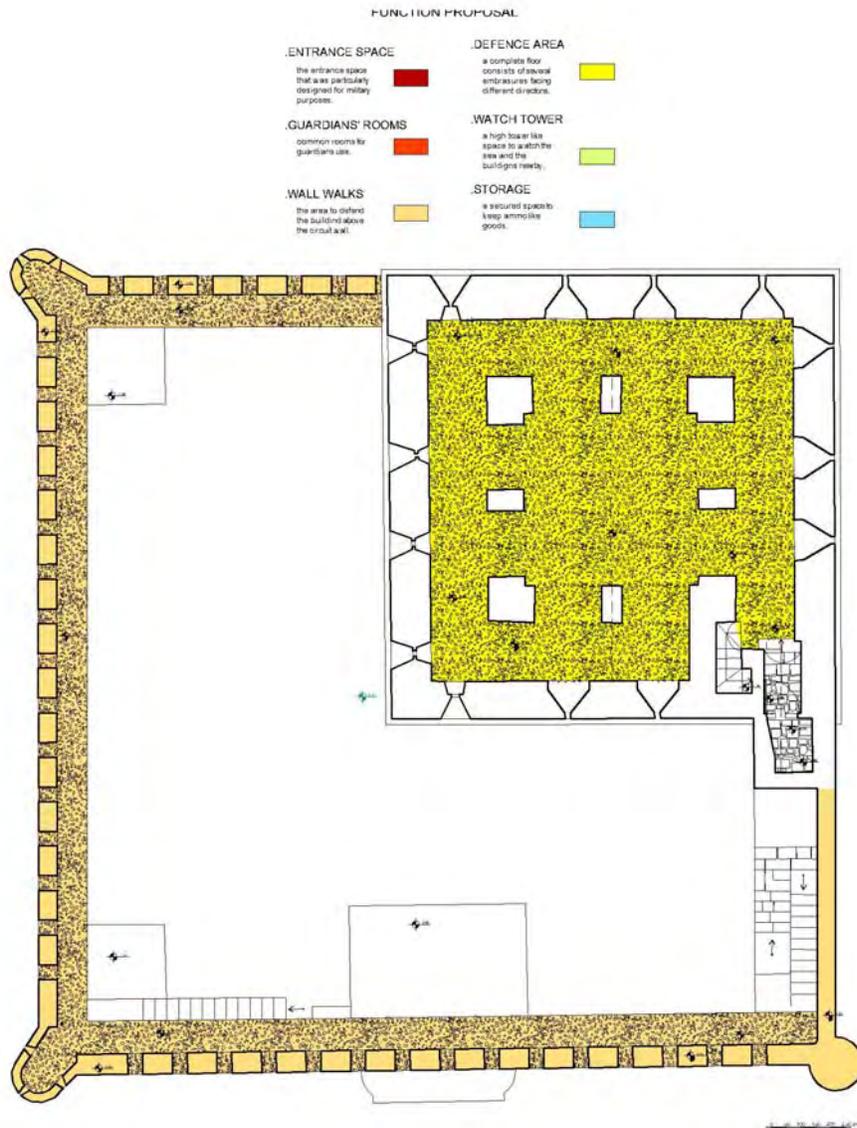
1<sup>st</sup> Floor Plan – Distribution of the Original Functions of the Spaces.
